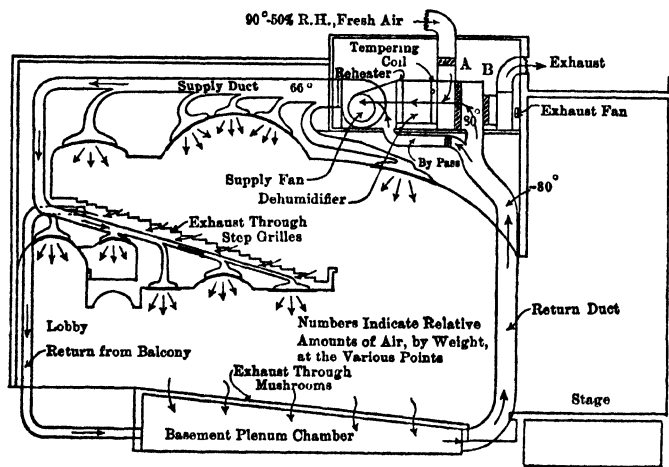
Section through Theater Showing Cooling Plant. Downward System
